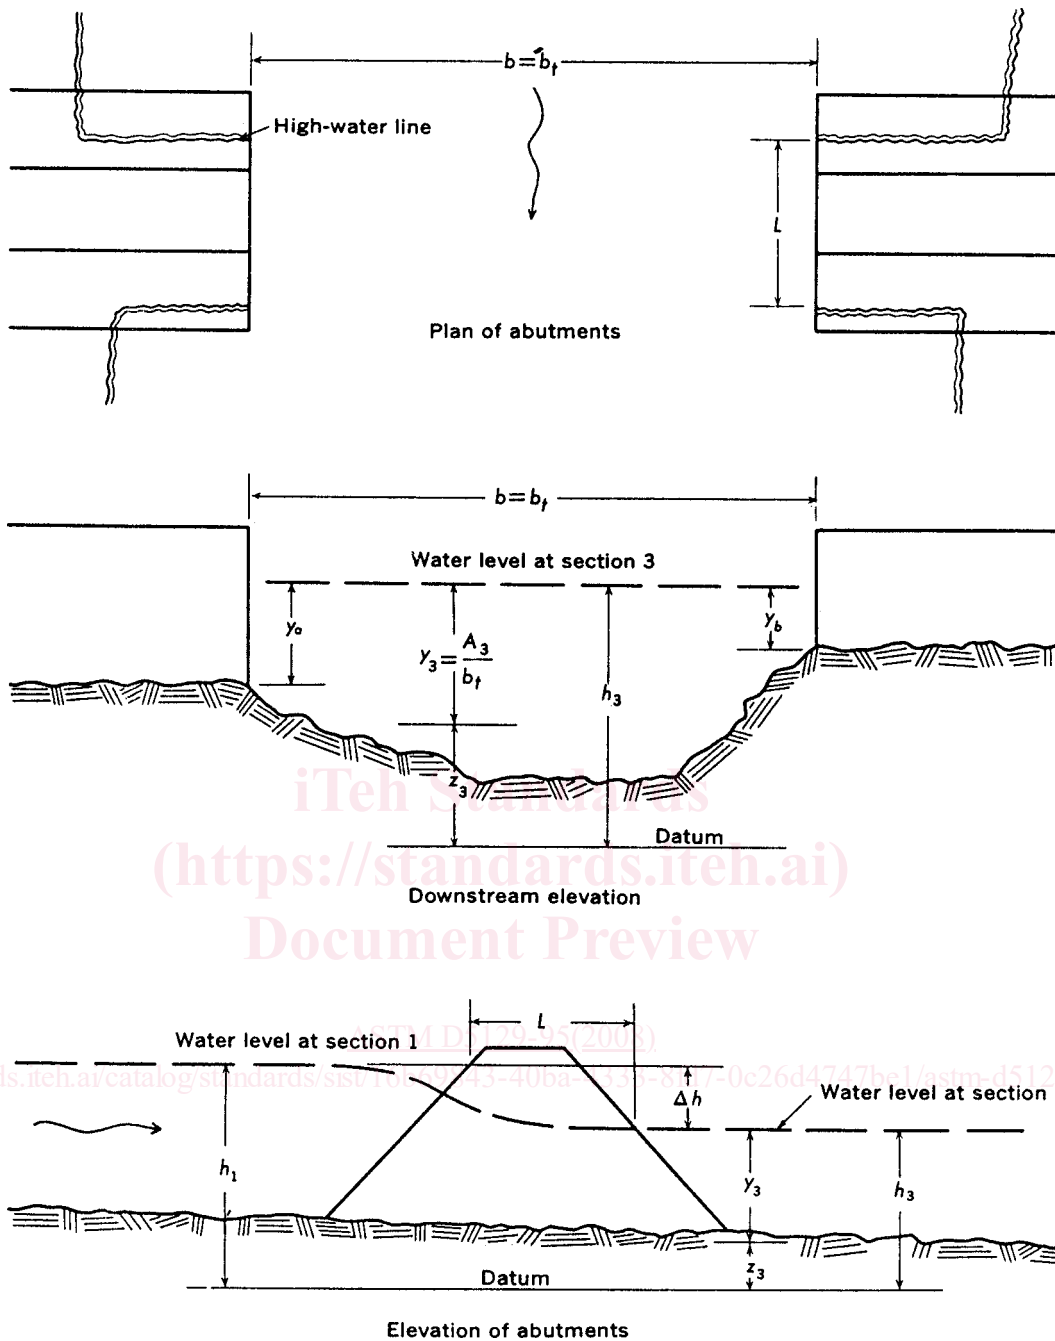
Definition Sketch of a Type 2 Opening, Sloping Embankments and Vertical Abutments
